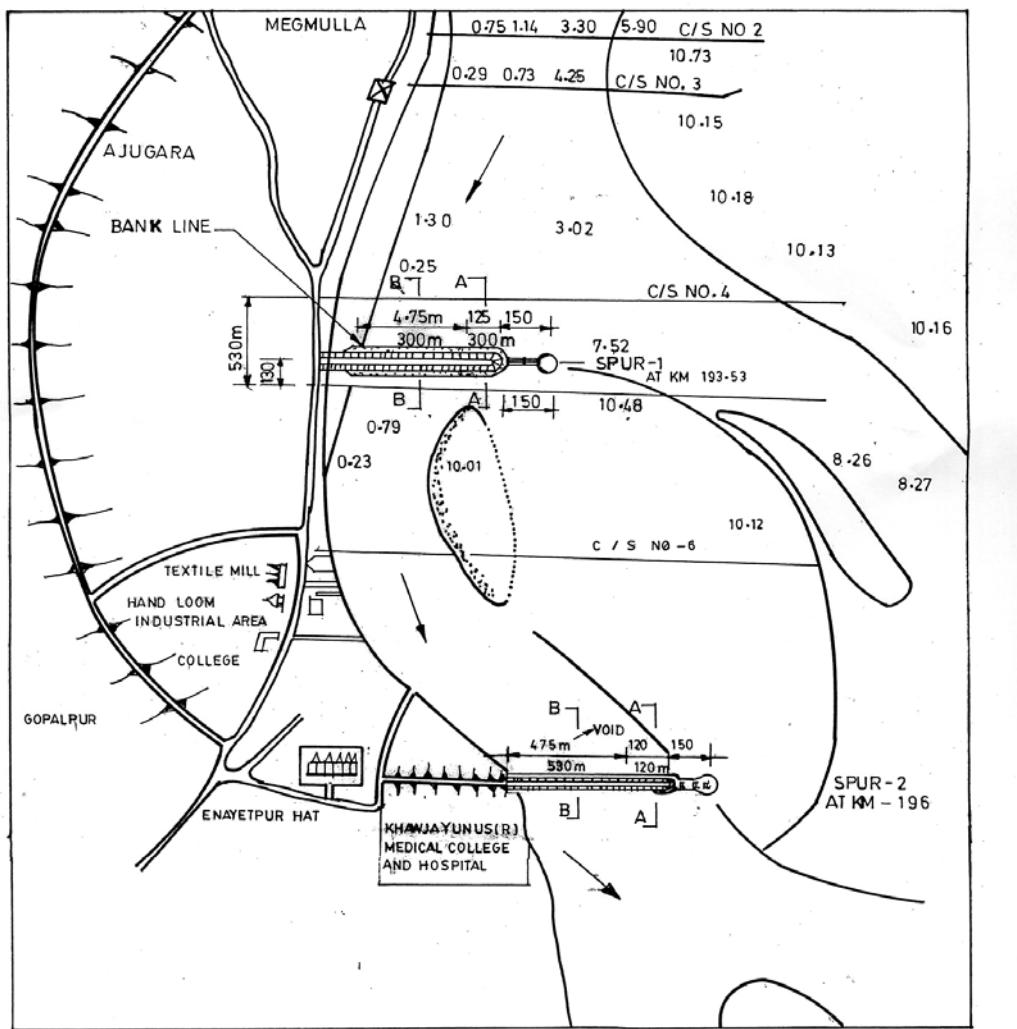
Betil and Enayetpur Site plan of a typical RCC groyne (Source: Uddin 2007)
